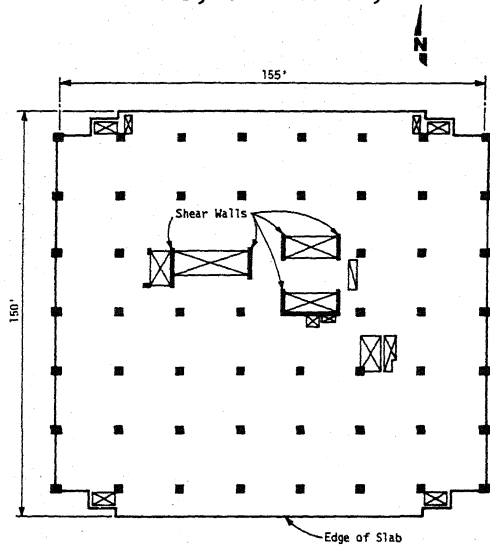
TOWER: TYPICAL FLOOR PLAN
